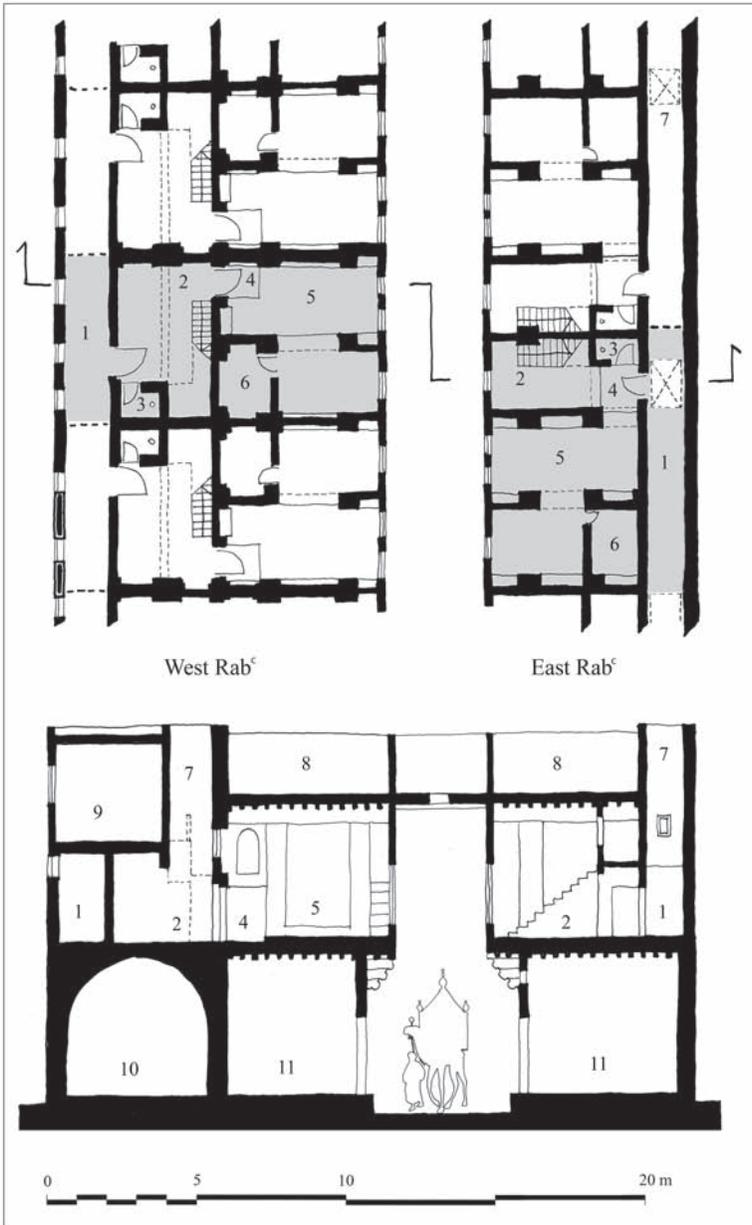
Sketch plan of typical apartments in eastern and western blocks with area occupied by each unit shown in grey (top). Typical section through street (with *mahmal* in profile), shops and apartments (bottom). Key: 1, corridor; 2, stairs to upper floor; 3, latrine; 4, *durqā'a*; 5, main *rivāq*; 6, service space; 7, light well; 8, roof terrace; 9, bedroom; 10, storage; 11, shop. Author's drawing.
